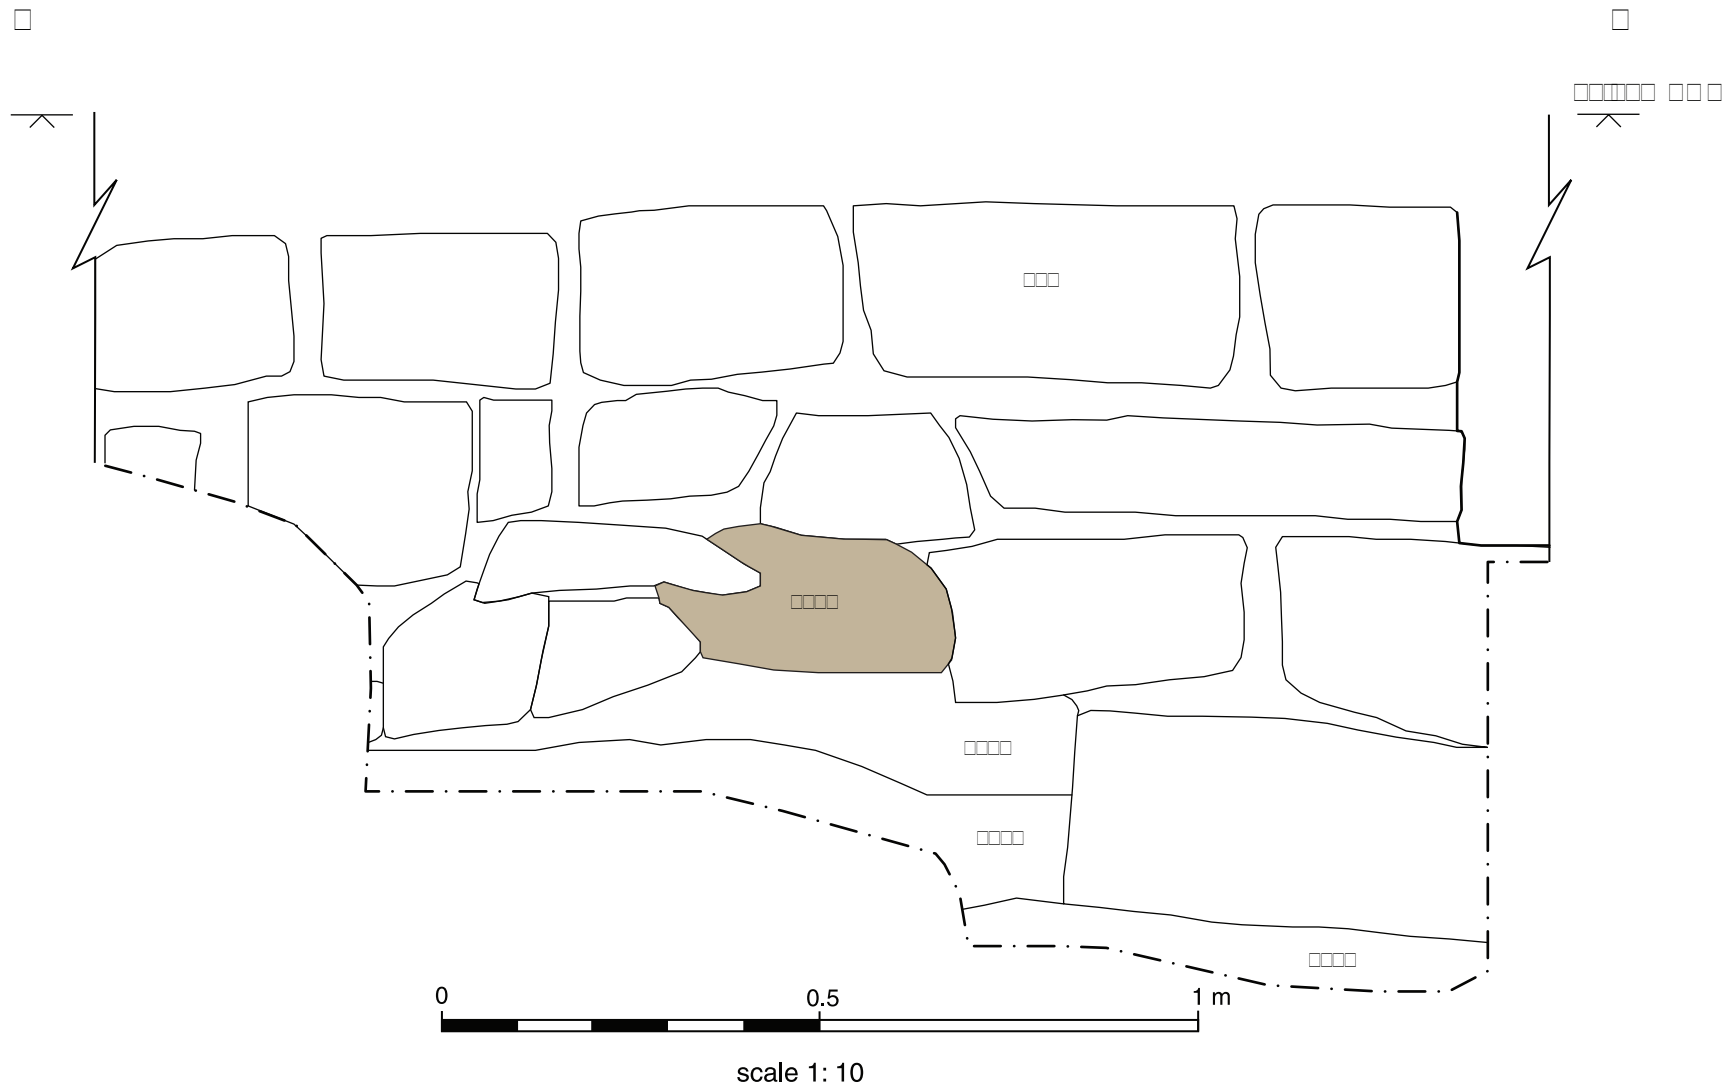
South Facing Section of Trial Pit 10 (Section 18)
